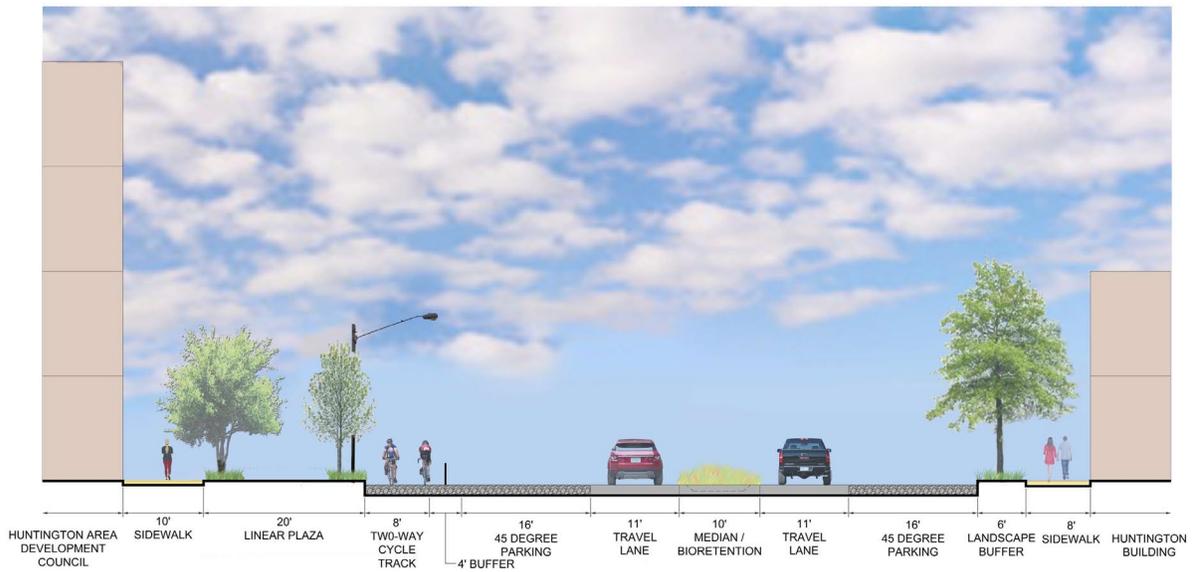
5th Avenue Complete Street Part 2 (6th Street to 10th Street)
